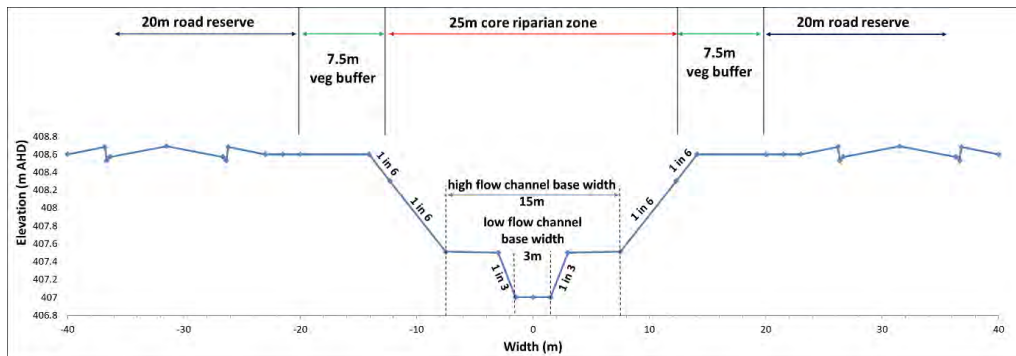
Conceptual arrangement of a typical cross section for a 40m wide waterway corridor
